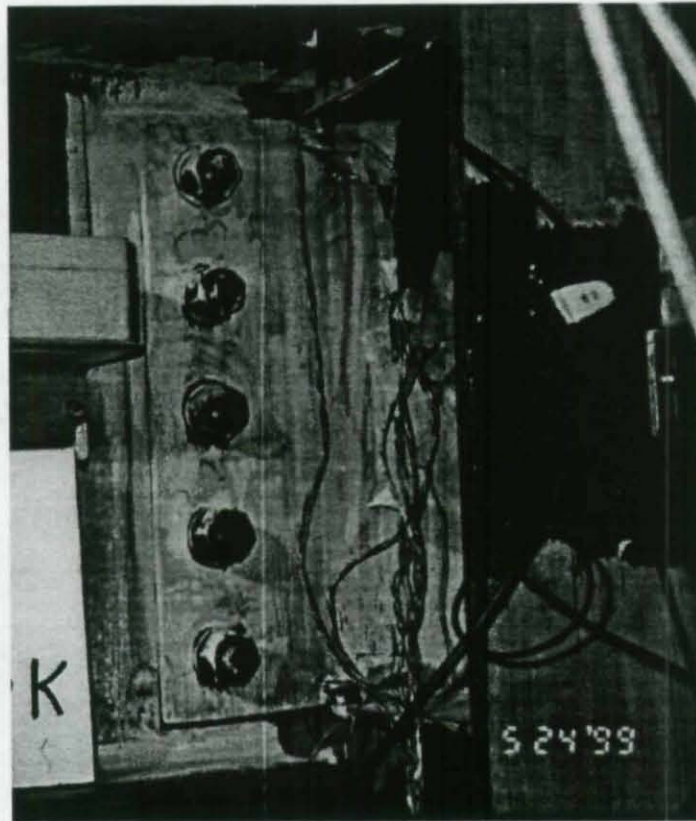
Stiffened extended shear tab with strain gages and wiring (Test 4-C)
